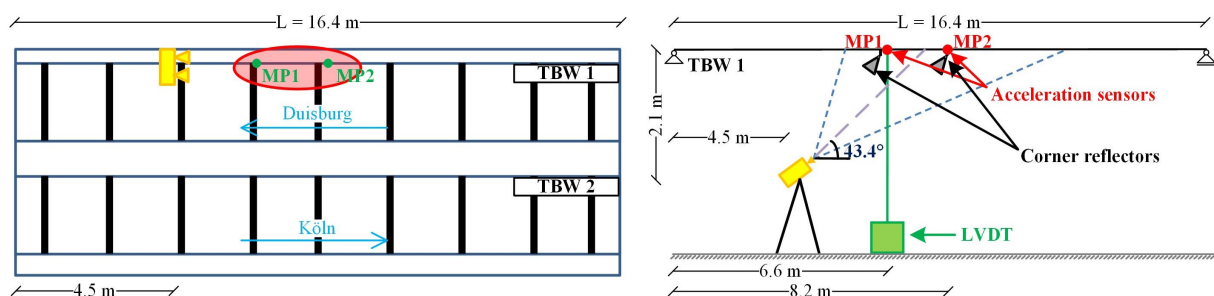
Measurement layout *Garather Bach*: top view (left) and side view (right)
